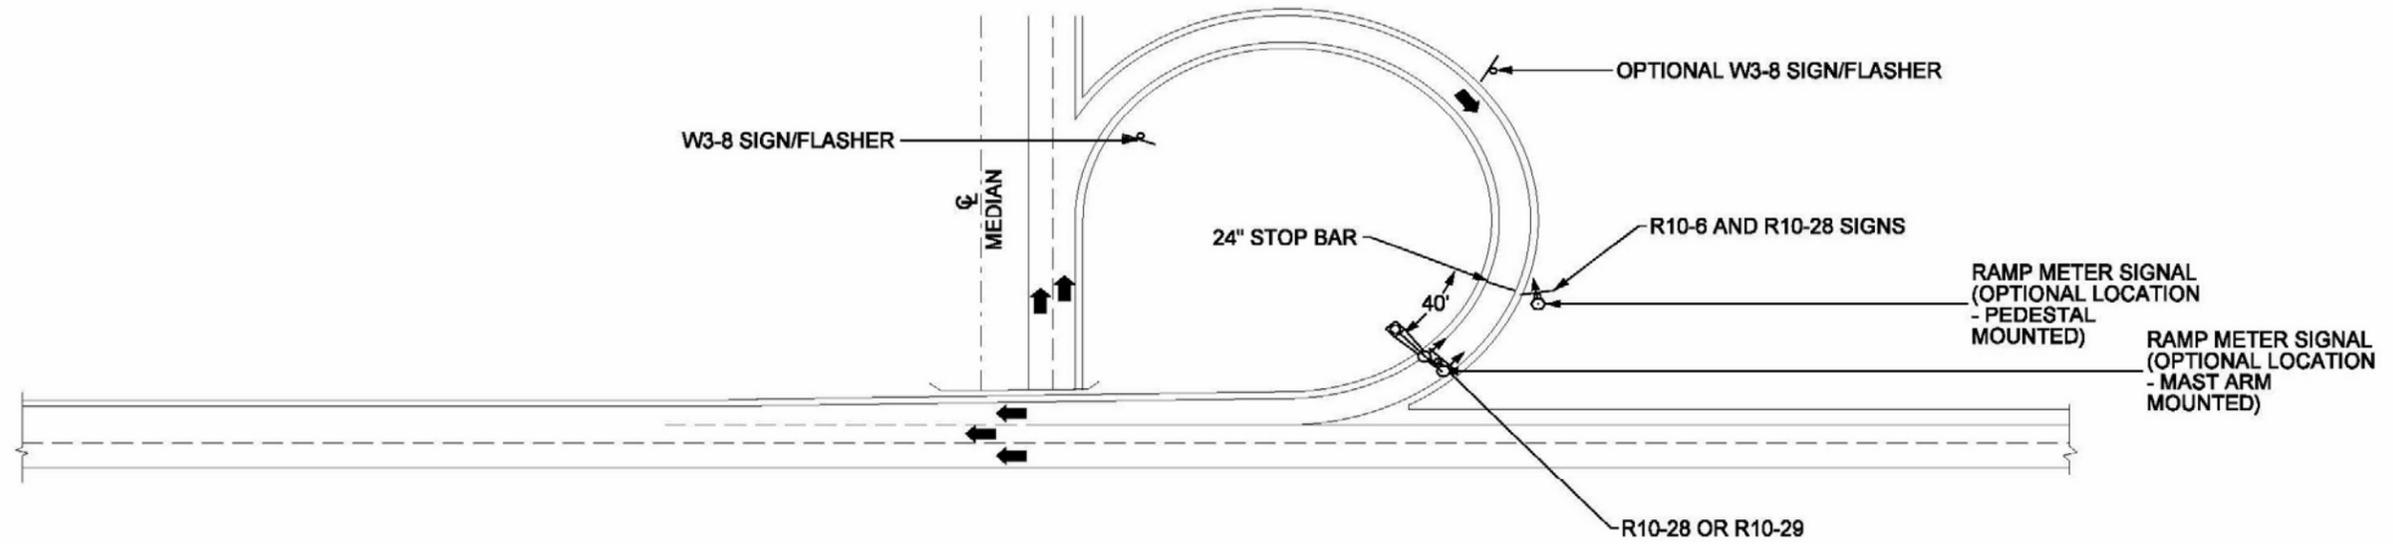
Non-Freeway-to-Freeway Ramp Meter Signing and Pavement Markings
